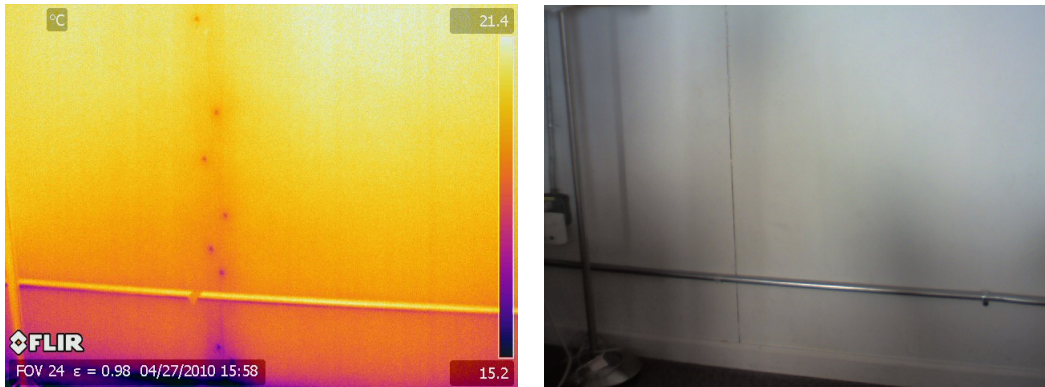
Vertical seam between SIPs does not show separation (north interior wall in dining area).
